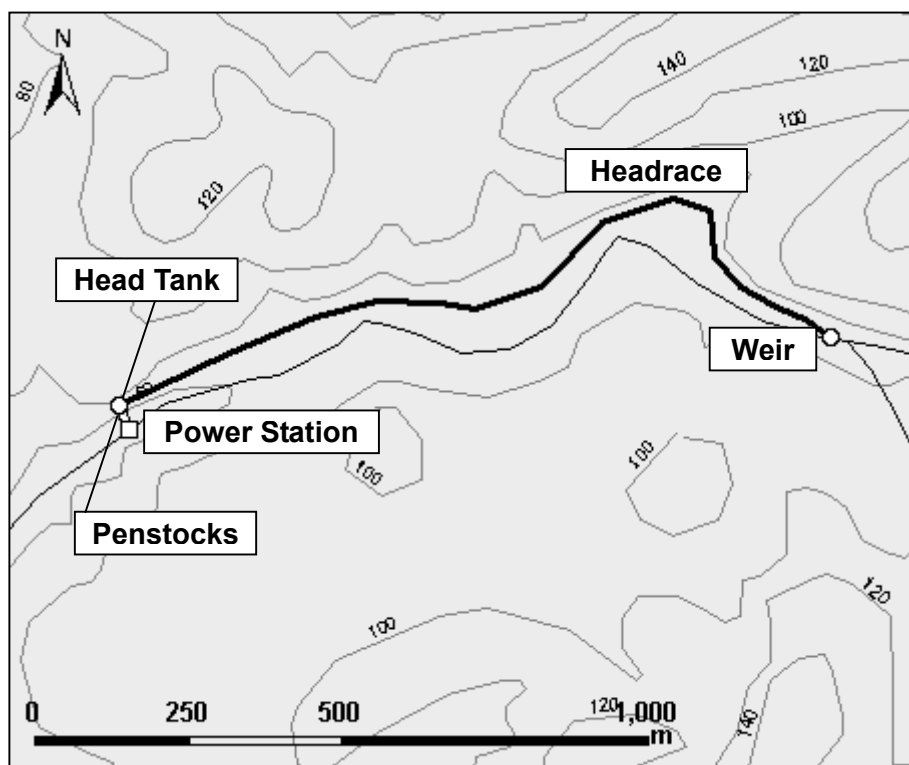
Trial Civil Structure Arrangement at Aramaywan Potential Site
